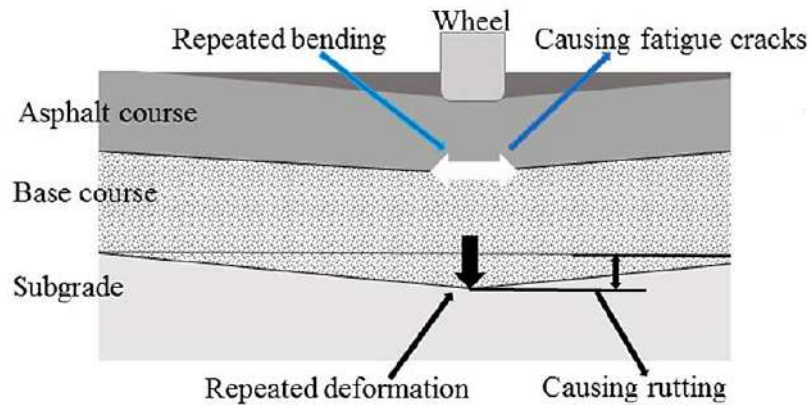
Shows mechanism of rutting occurs in flexible pavement [38]
